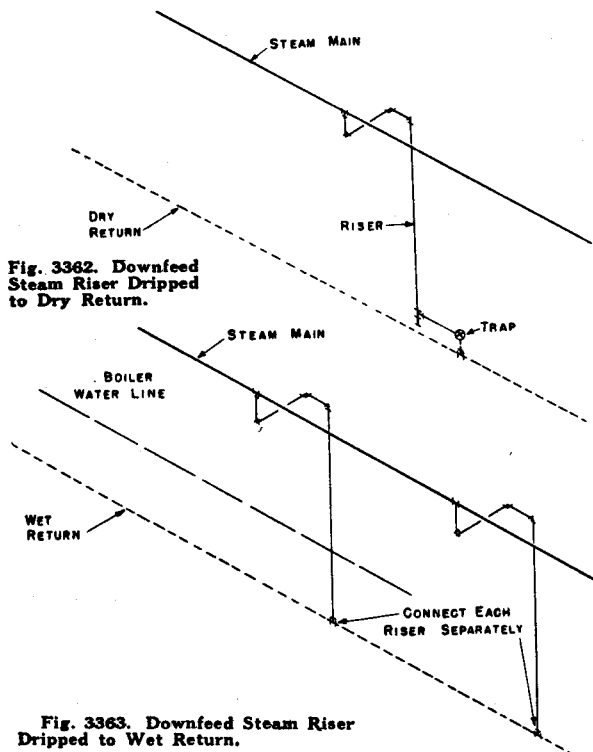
Downfeed Steam Riser Dripped to Dry Return.
